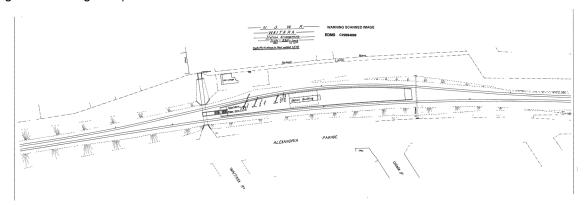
Plan of Waitara Station as constructed and completed in 1915. (Source: Sydney Trains Virtual Plan Room)
